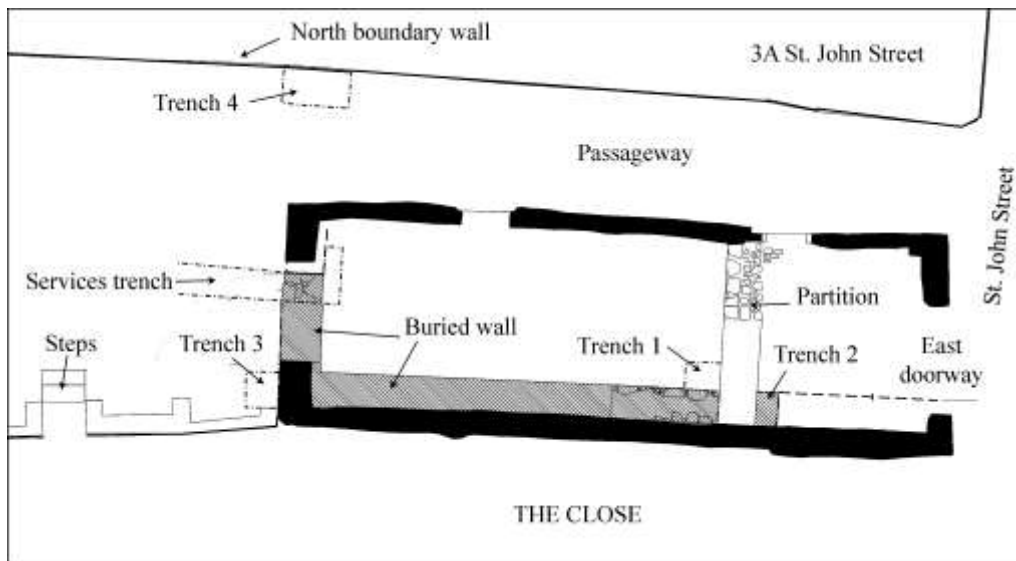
Plan of the barn showing the positions of the excavations and the stone wall
